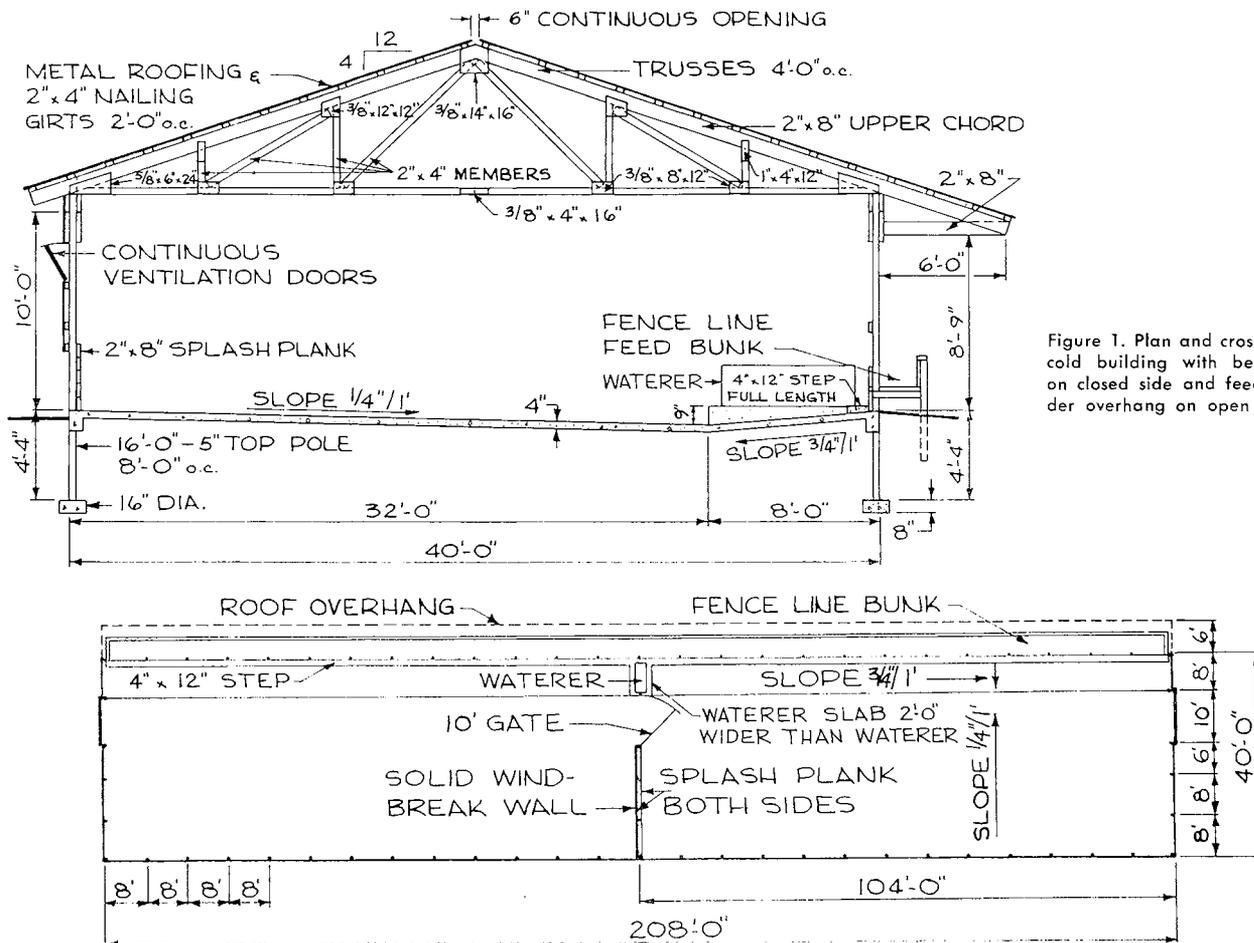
Plan and cross section of cold building with bedded area on closed side and feed bunk under overhang on open side.
